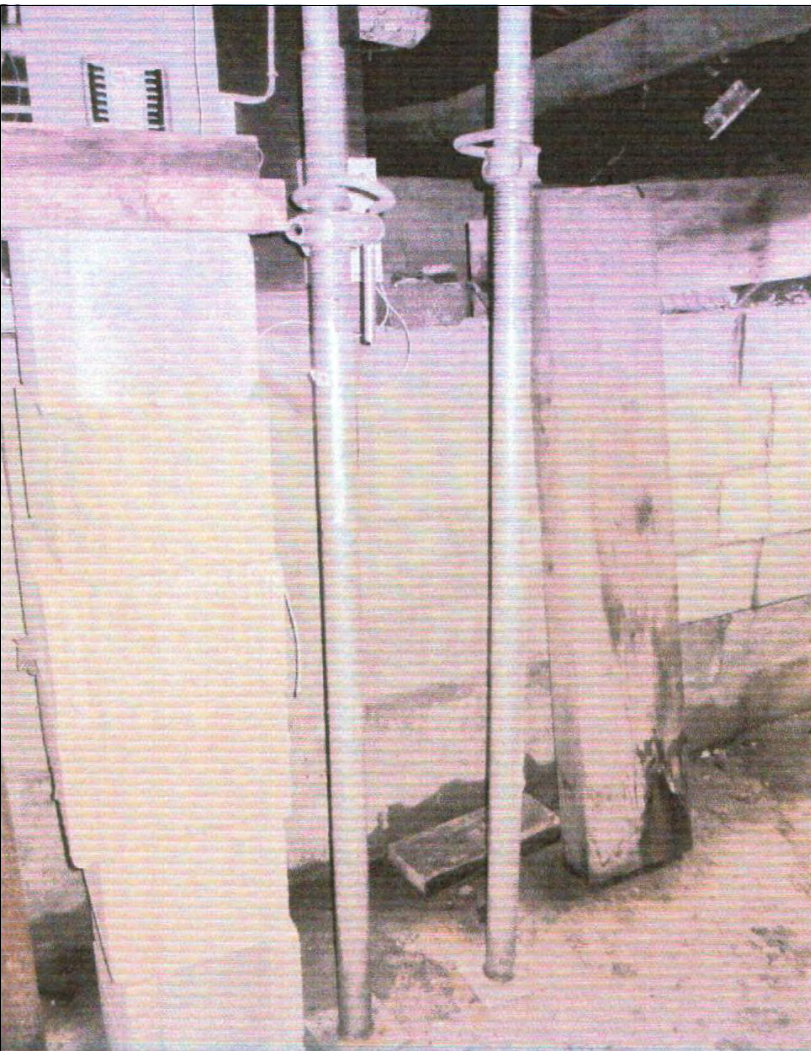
severe cracking in cinder block wall, structural integrity compromised
